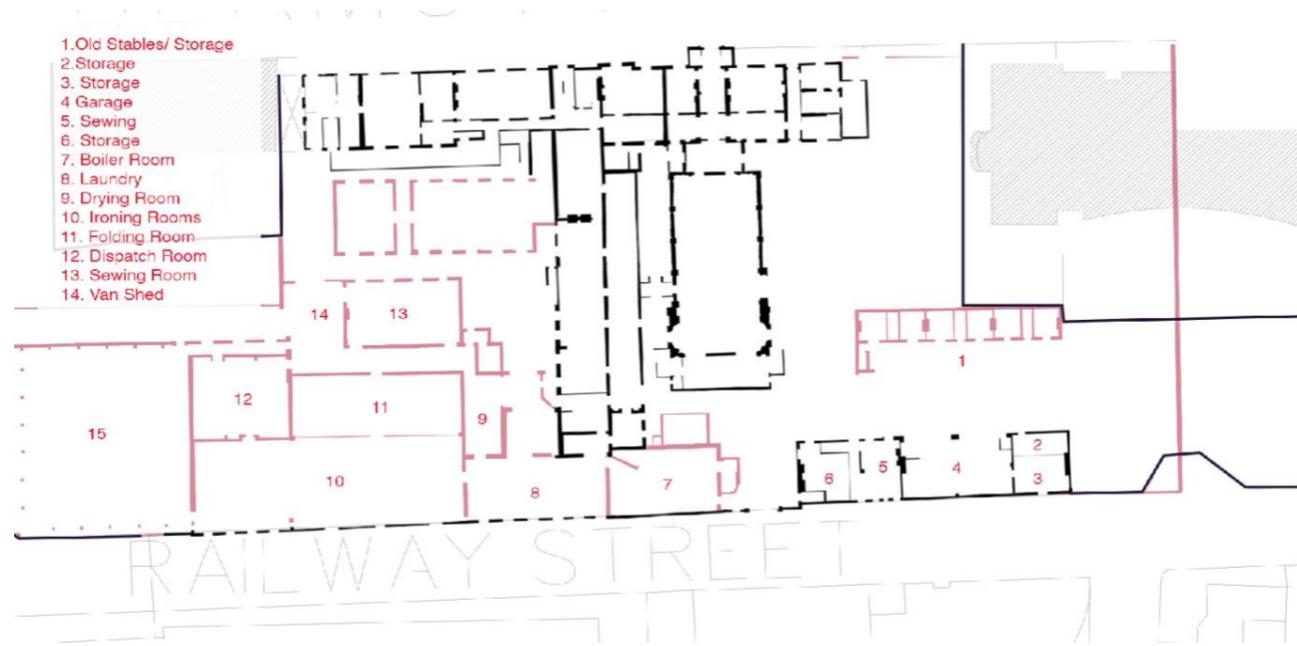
Ground Floor plan showing the now demolished Industrial buildings (red) (Source: Author's own drawing)
